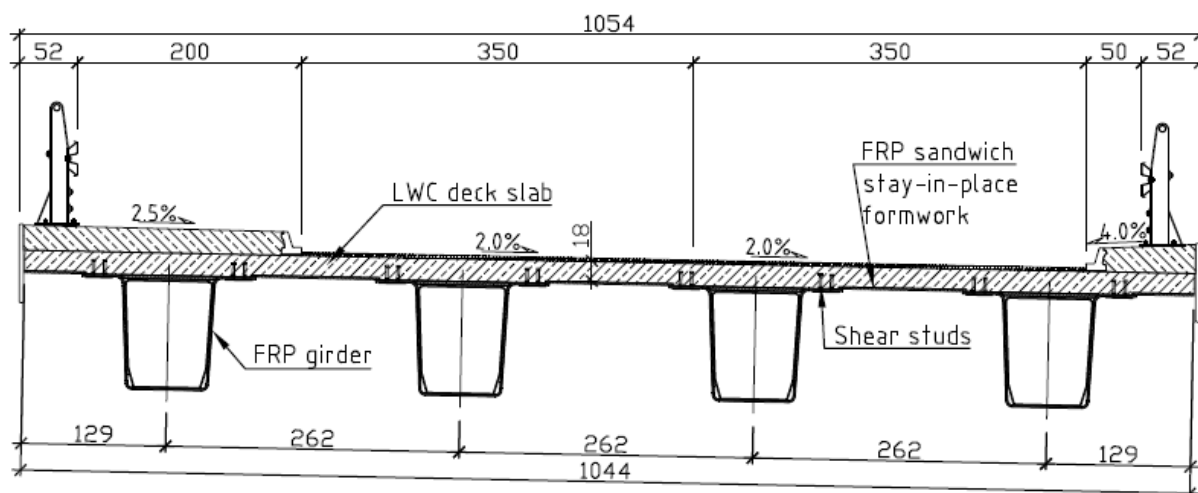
Cross-section of the bridge superstructure (units: [cm])
